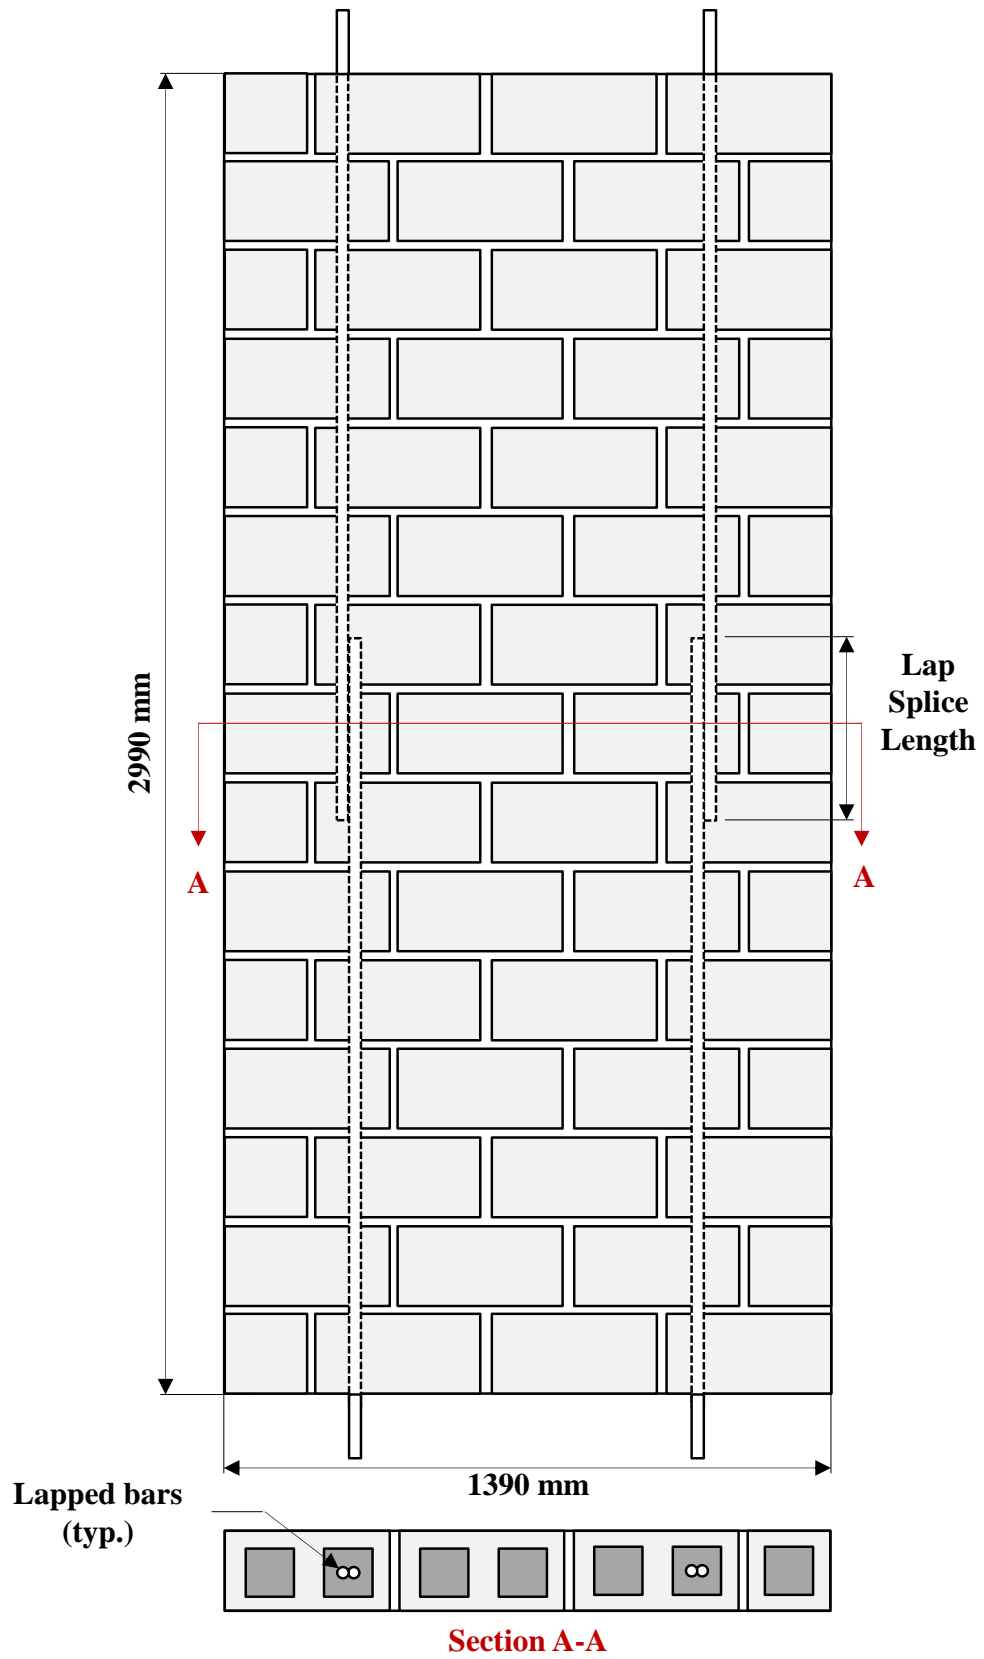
Wall splice specimens with spliced No. 25 reinforcement
